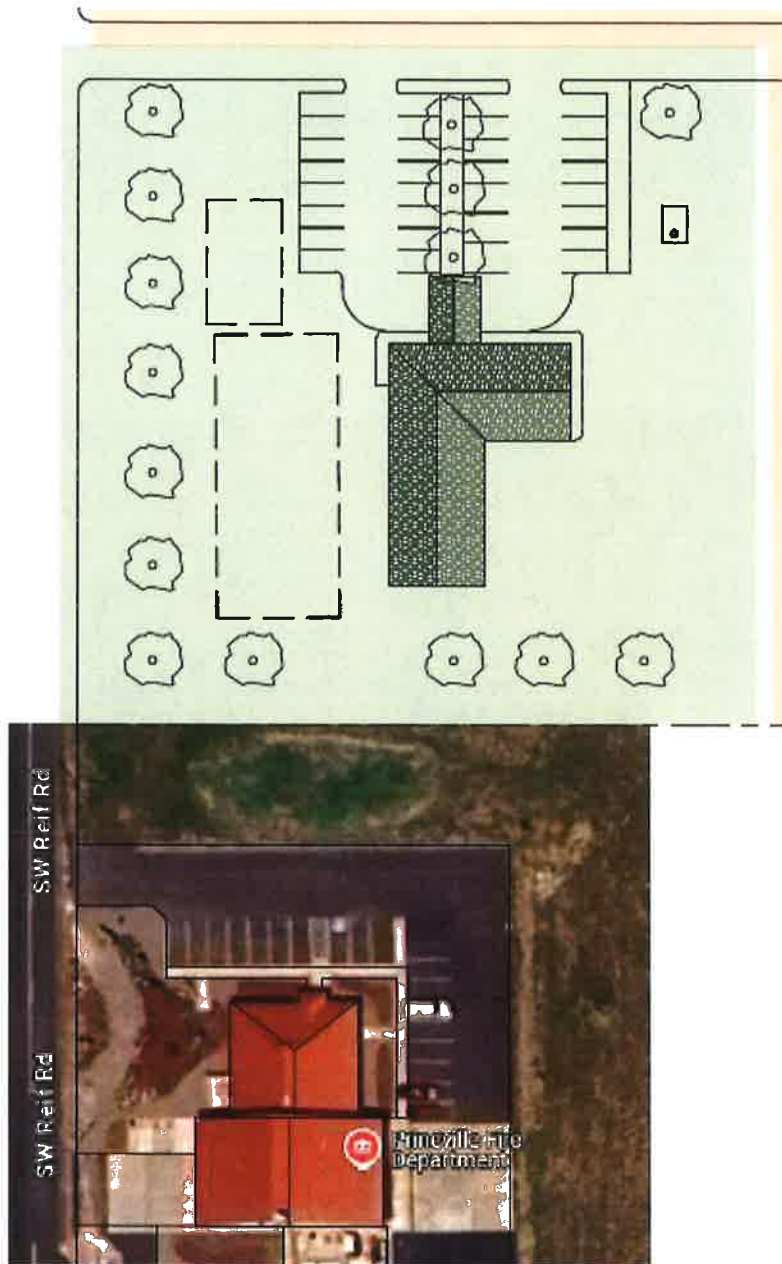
Preliminary Site Layout. Source: Suburban Renewal, dated 3/21/2025
